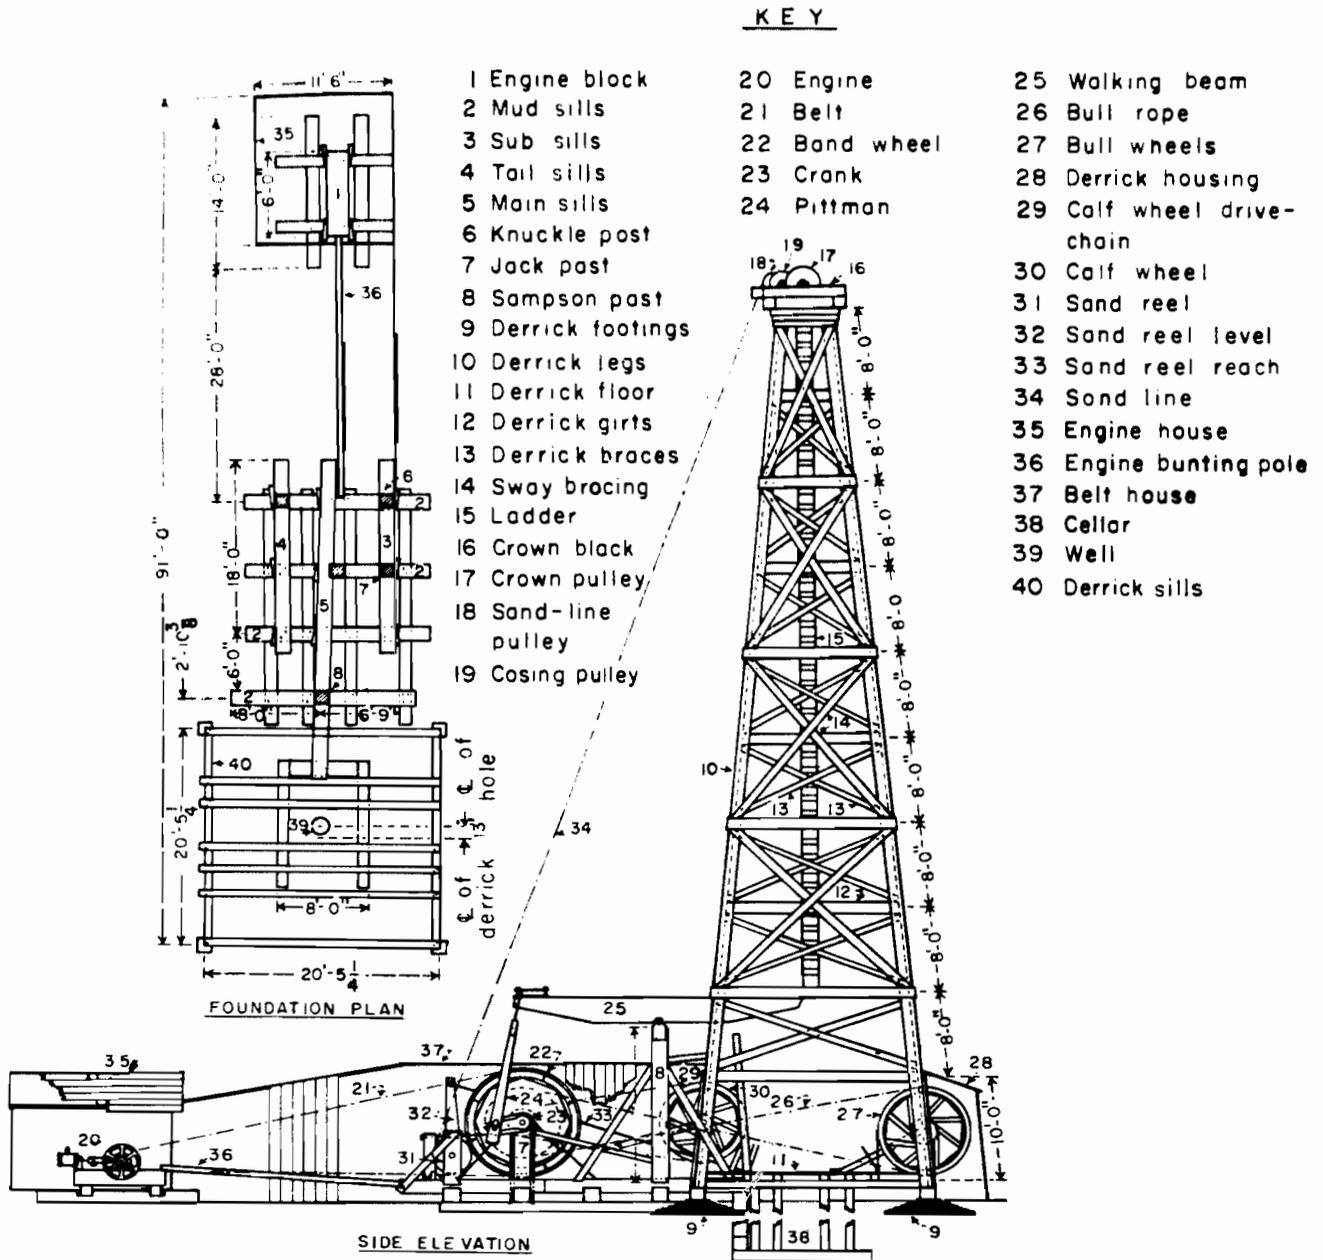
Plan and elevation of an 82-foot standard cable-tool rig and wooden derrick with all parts numbered.
